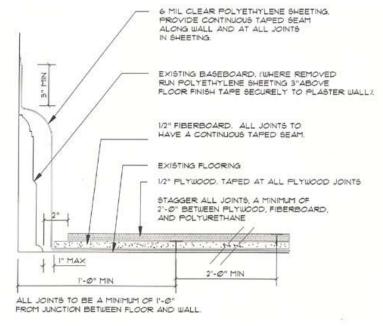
To provide for adequate floor protection in the New Jersey State Capitol, this area was swept clean, then covered with polyethylene sheeting to protect against spills and dirt abrasion. Fiberboard (1/2" thick) was placed over floors and the joints sealed with tape. Finally 1/2" plywood was laid with all joints taped. This floor protection system has been successful over many years of use and is recommended in major construction areas, and where tile, marble, parquetry wood, or other historic flooring is involved. Photo and drawing: Ford Farewell Mills and Gatsch Architects. (Click on diagram to expand)
